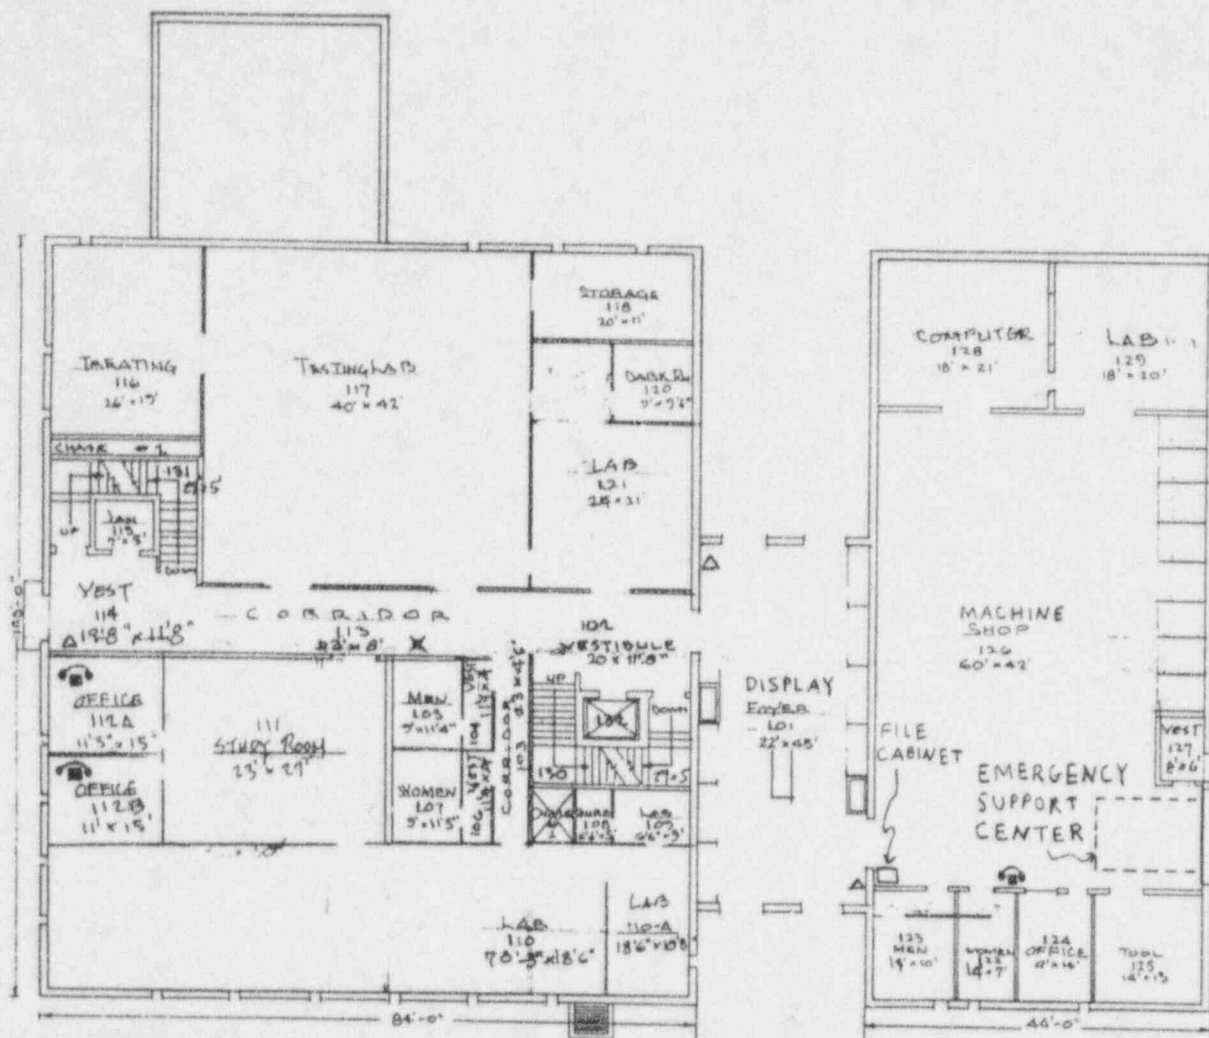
LEL Second-Level (ground) Floor Plan.
